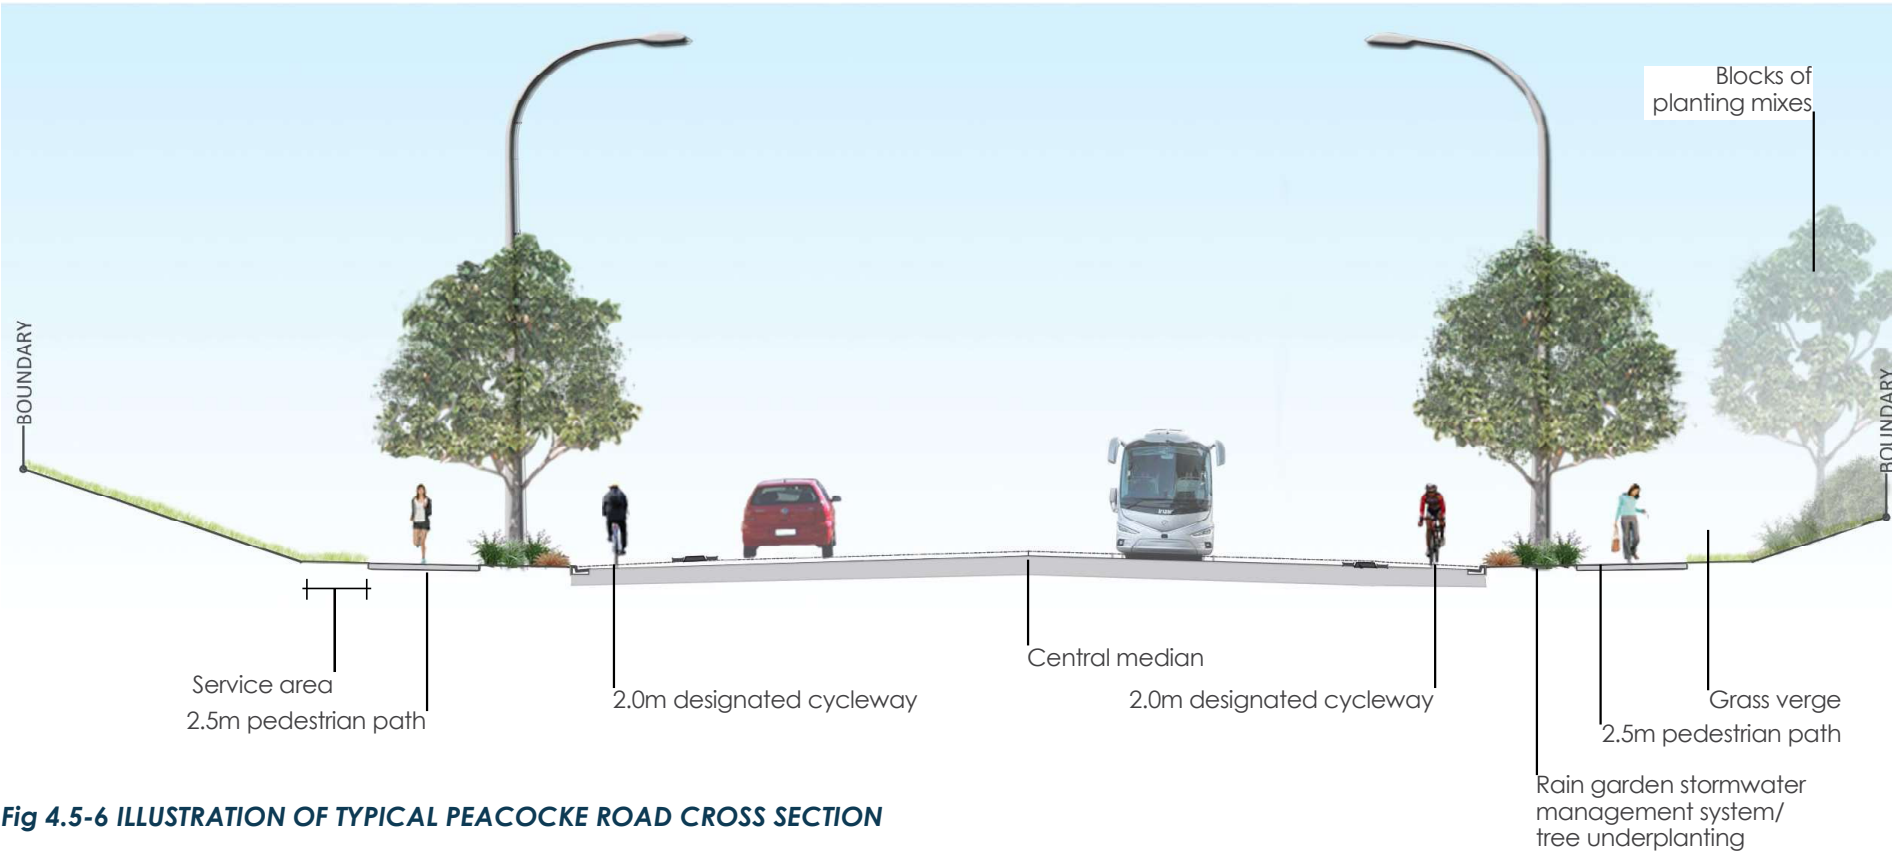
ILLUSTRATION OF TYPICAL PEACOCKE ROAD CROSS SECTION
